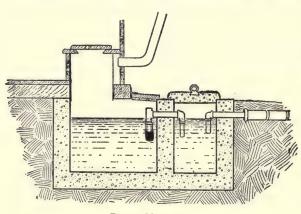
L.R.S. PRIVY WITH CONCRETE TANKS
